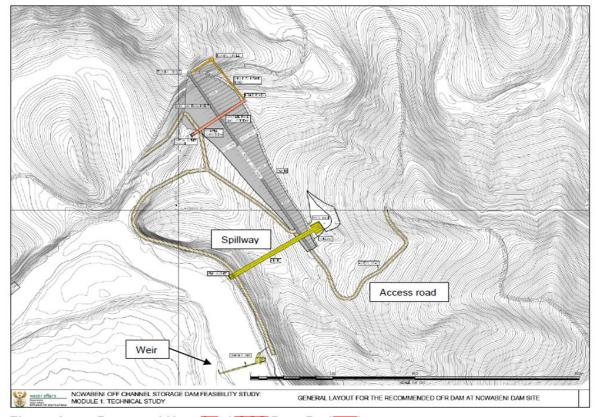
Proposed CwabeniCwabeni Off-Channel Storage Dam Project layout.
